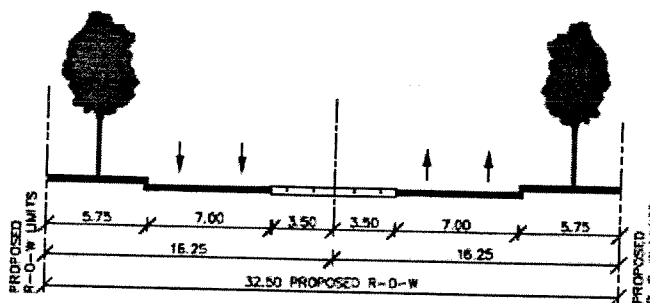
Typical cross-section South of Front Street to Rail Corridor.
